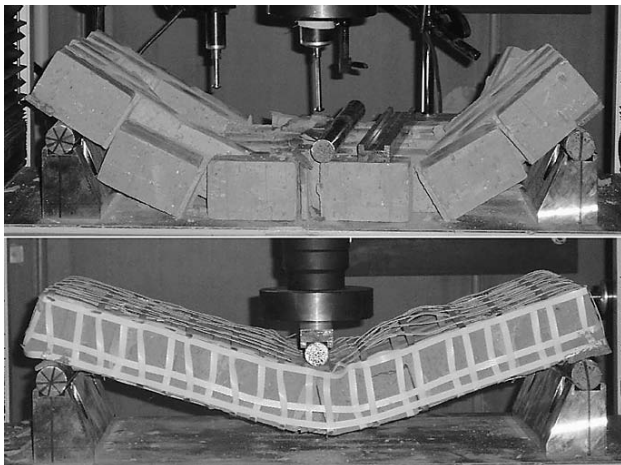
Failure patterns of brick masonry wallettes with and without retrofitting by PP-band mesh
